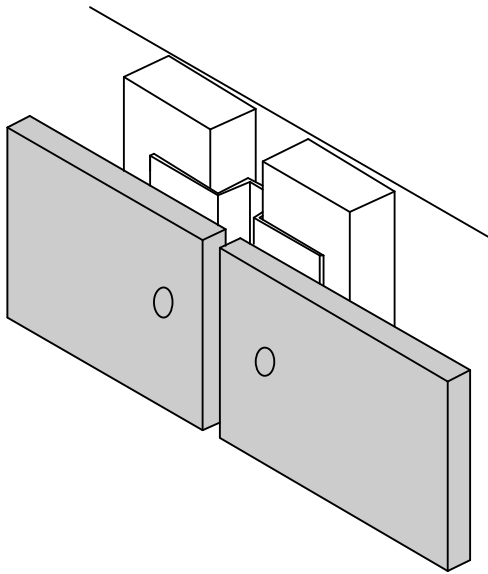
Open vertical joint with preformed metal 'top hat' flashing.
